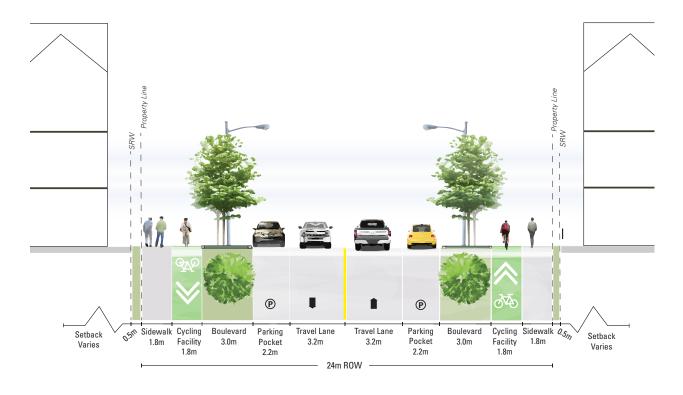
J: Main Street Collector Cross Section - 24 m Road Allowance with Commercial Frontage
